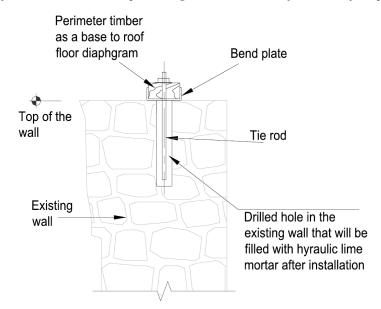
Details of the tie-rods that are providing connection base for the roof diaphragm
